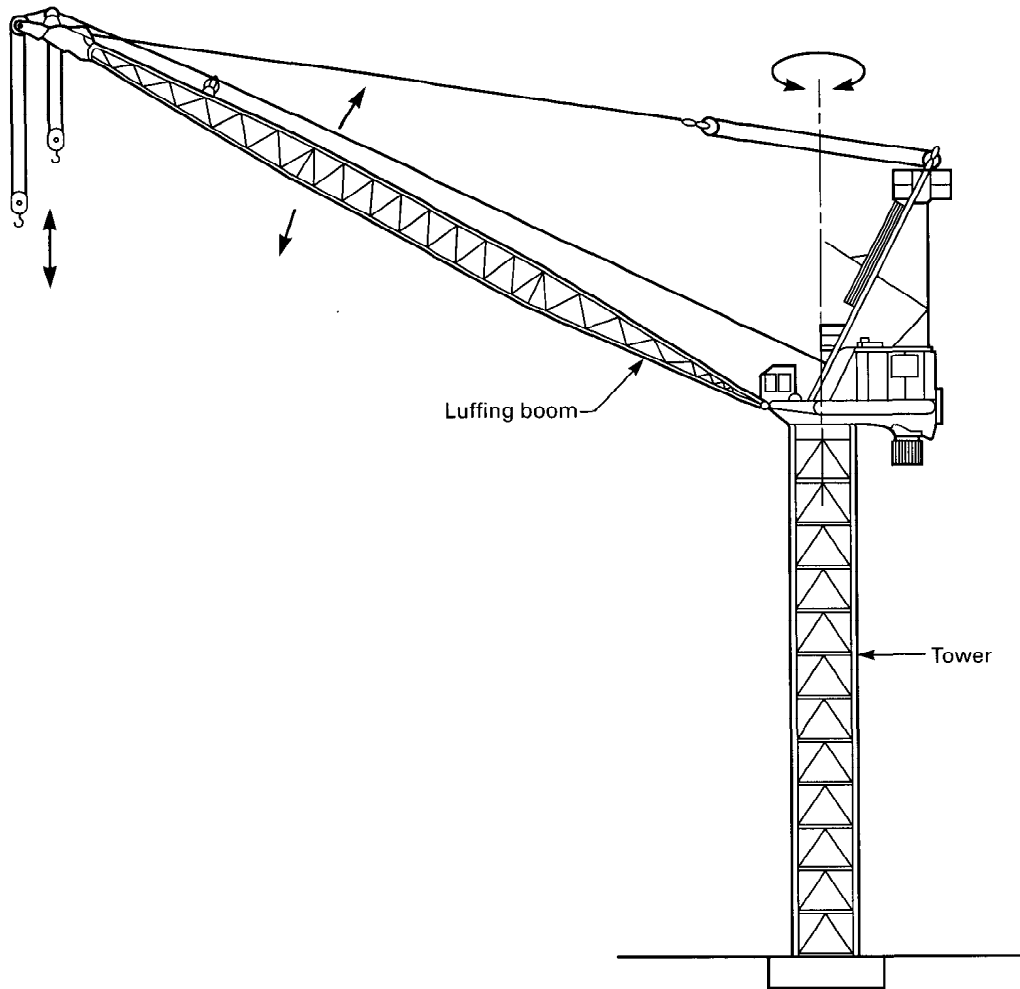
Luffing Boom Tower Crane on a Fixed Base
